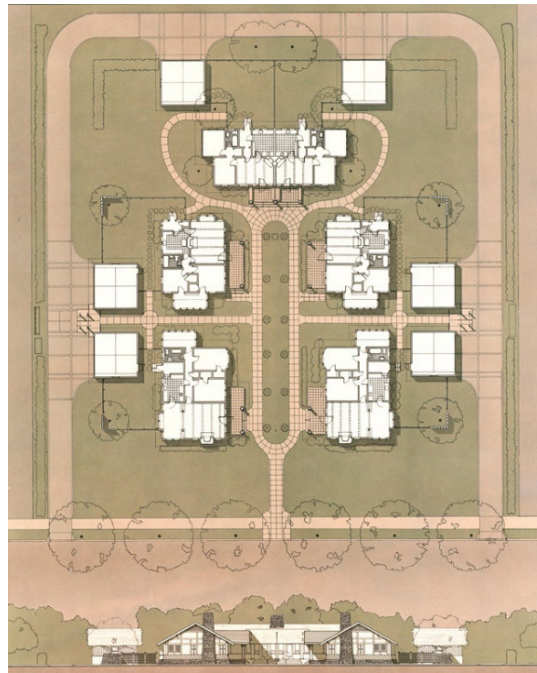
The 1984 site plan and section of Gatz Court. Along with restoring the four detached bungalows and one duplex, the designers added additional garages and small enclosed backyards to each unit (Luke 2010).
